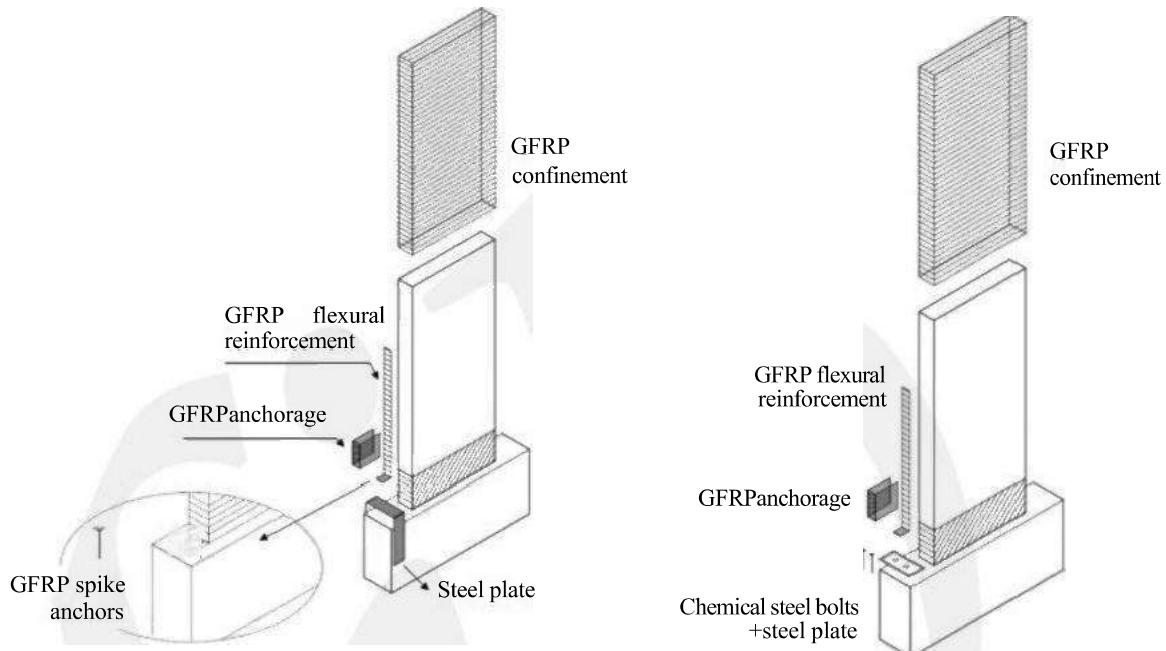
Anchorage systems at footing zone of shear walls²¹
